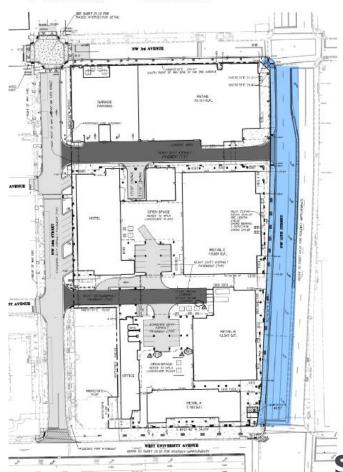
" - NW 14TH STREET (ON-SITE)
